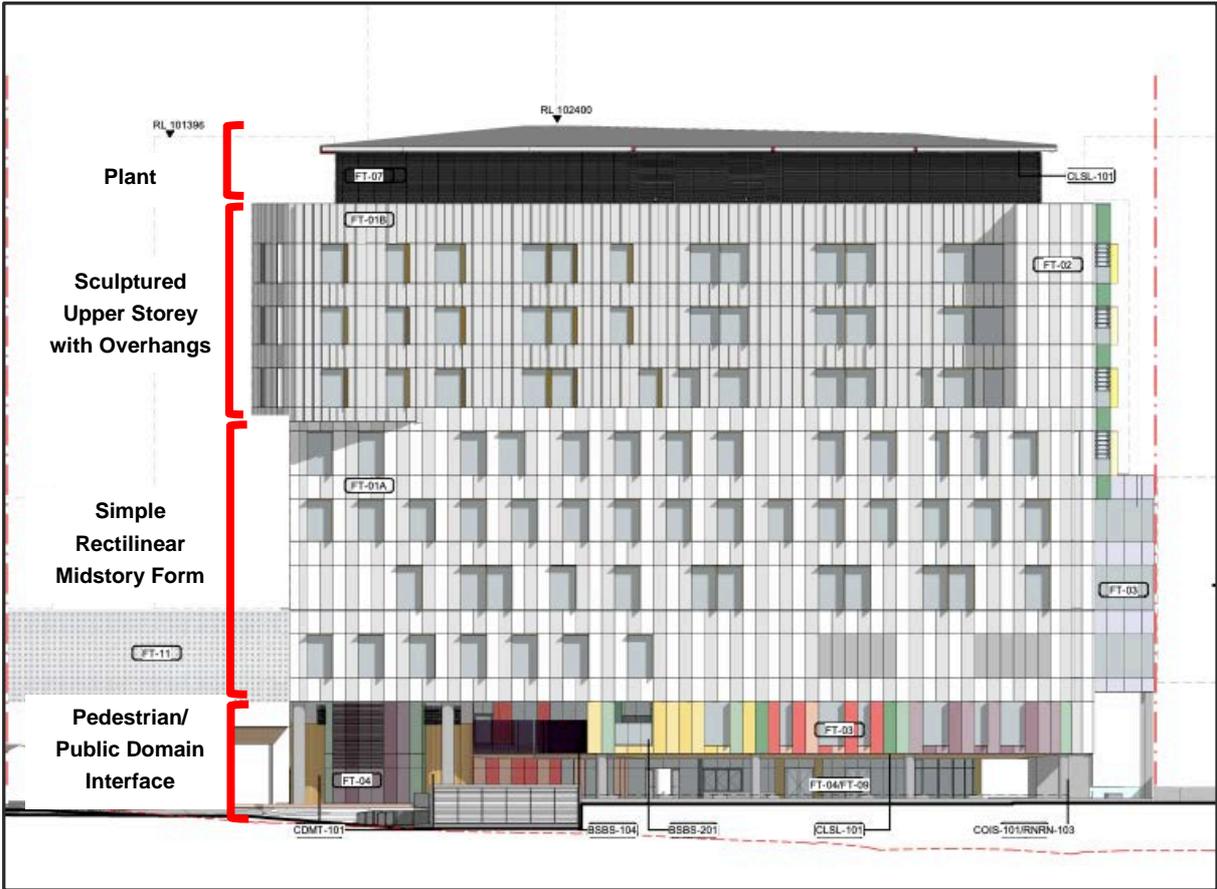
| Northern (High Street) elevation and key built form elements (Base source: RtS)
